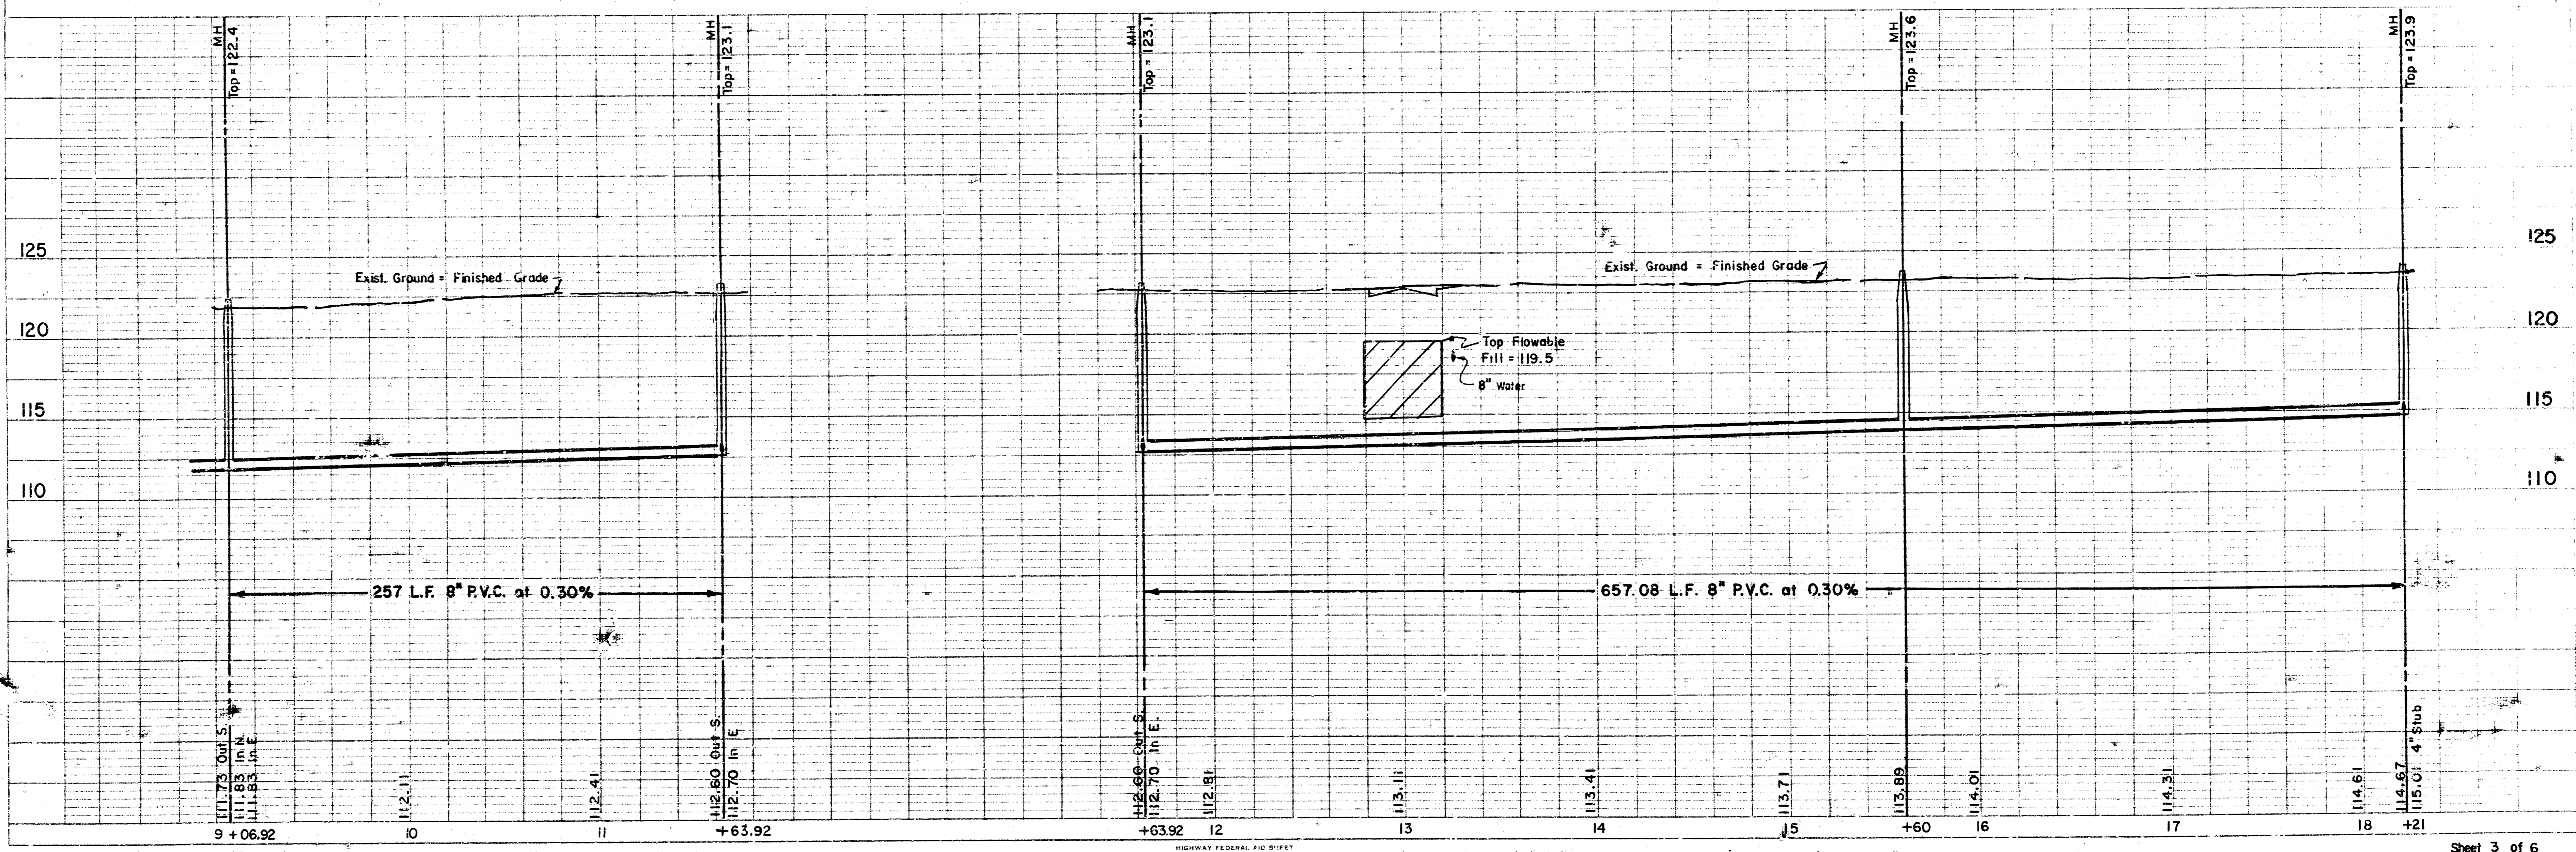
SINGLE PLAN AND PROFILE-FULL LINE
